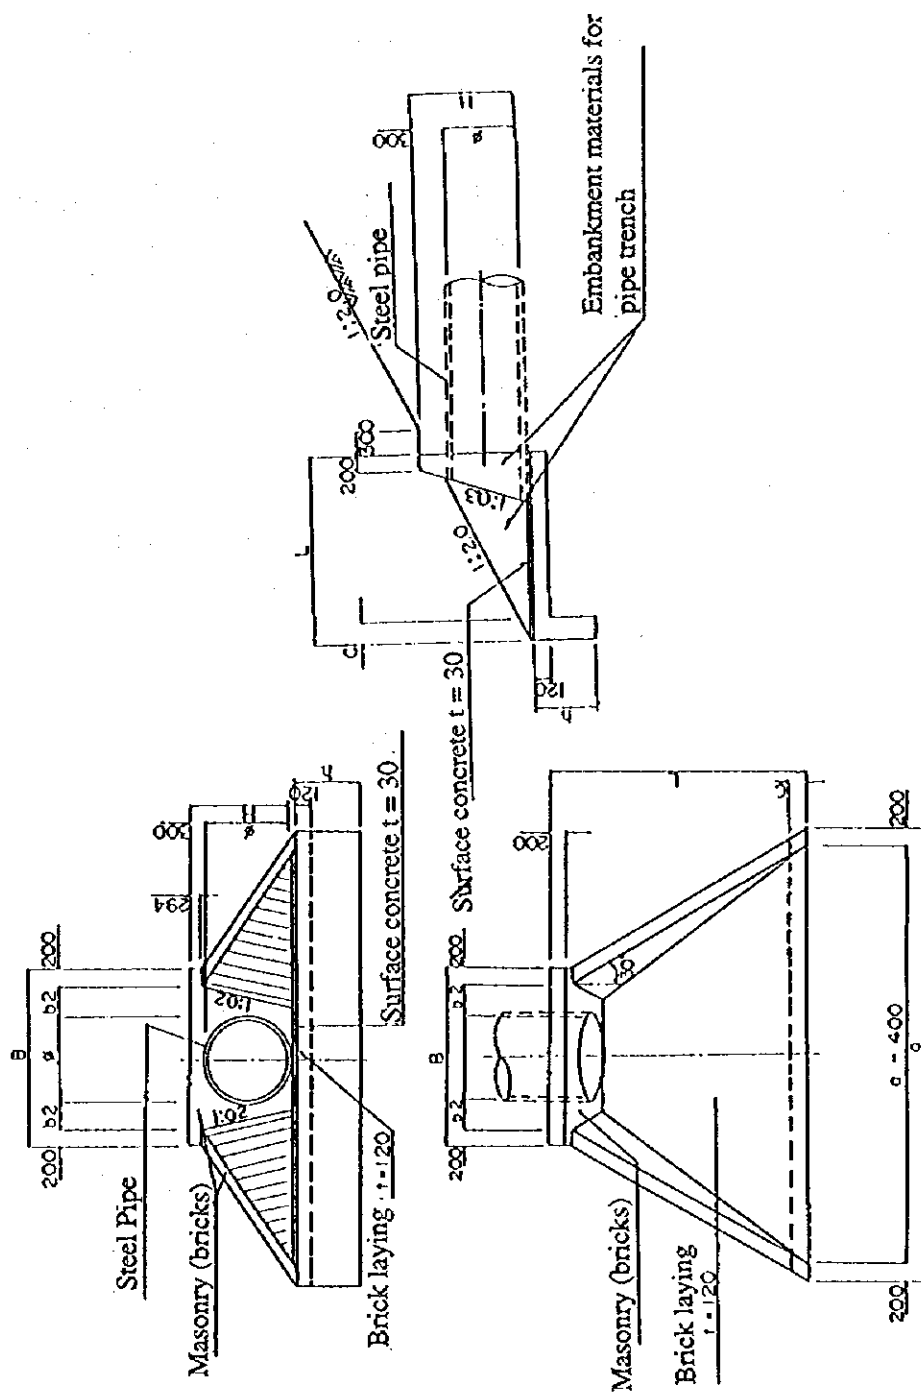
Typical Cross Section of Steel Corrugated Pipes
